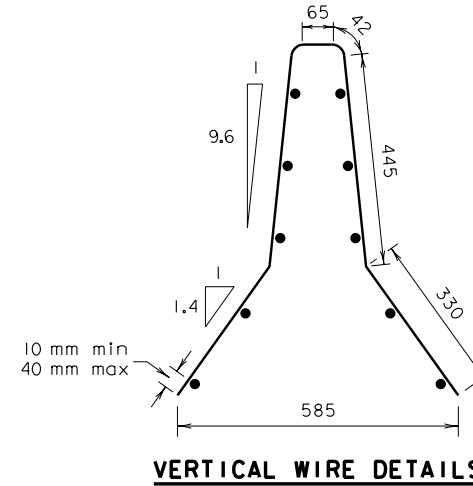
DETAILS OF WELDED WIRE FABRIC OPTION
